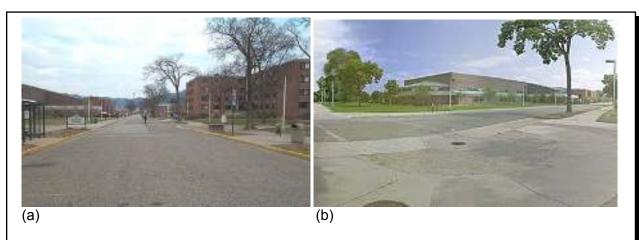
Flooding Location on Badger Street North of Hutchison Hall
